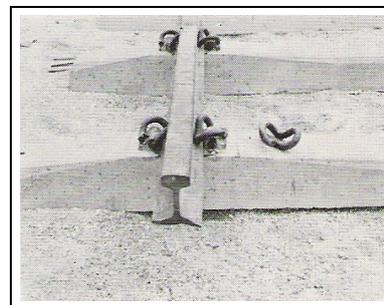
Pandrol fastening, Preconar's Plant, Arequipa
